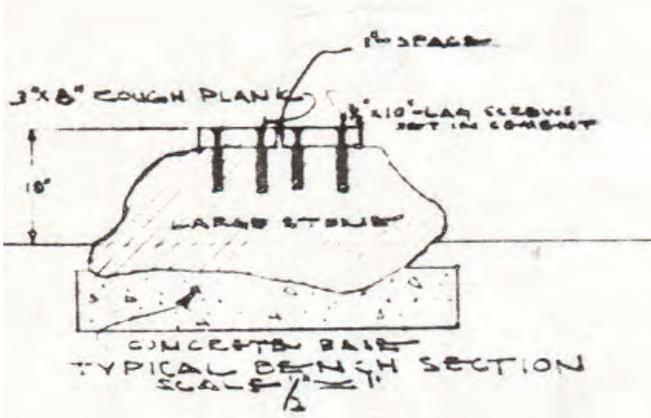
Cross-section showing construction of semi-circular bench, to be duplicated in reconstruction.
